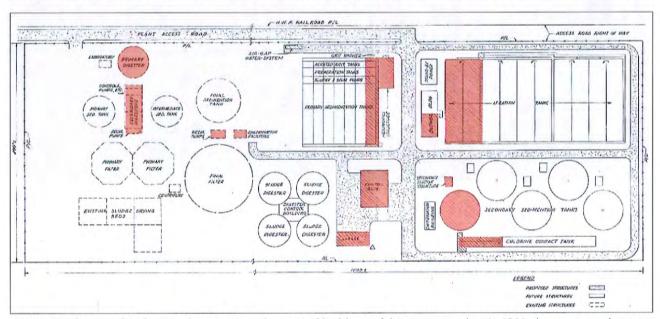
The site plan showing the existing and proposed buildings of the treatment plant in 1966; the structures that are still extant are highlighted in red (M. C. Yoder Associates, 1966).
